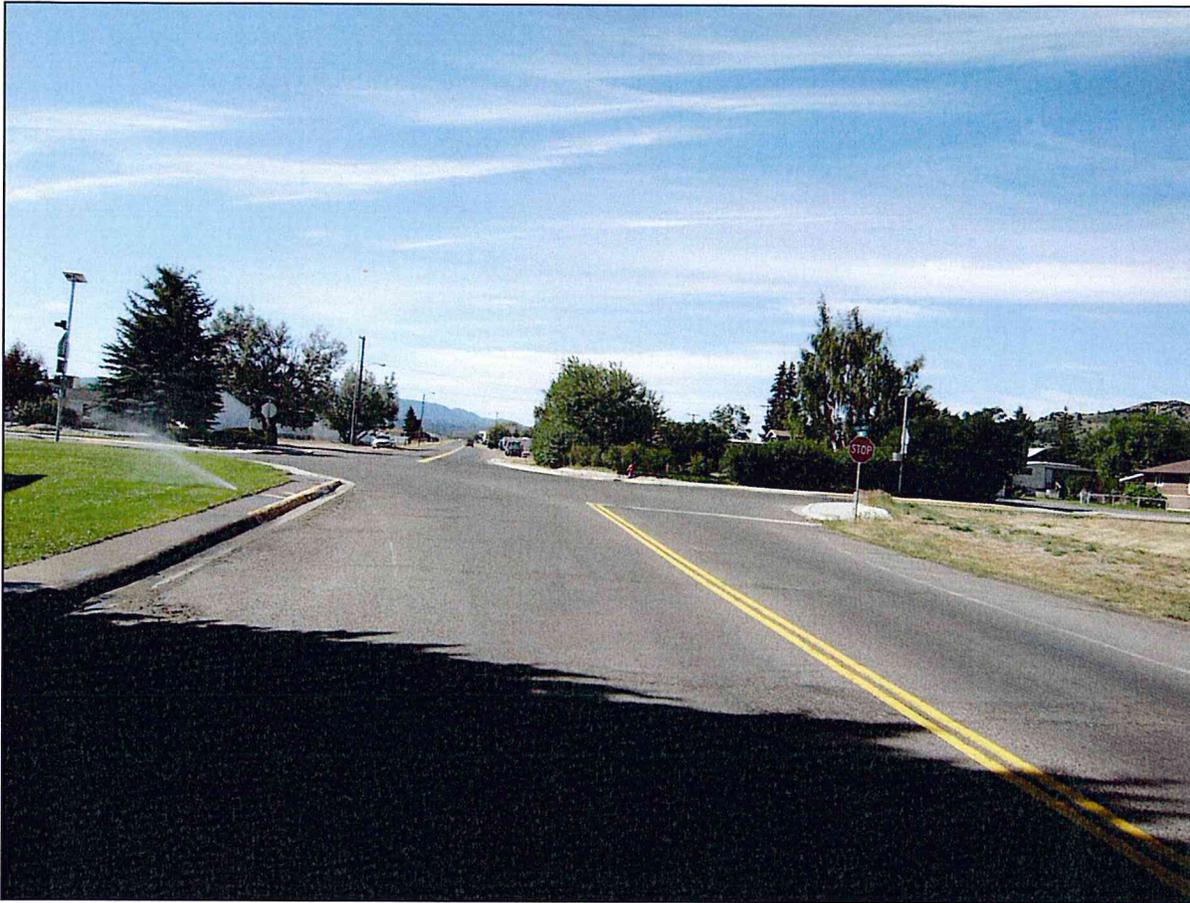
Overview of project area. Looking south along Hill Avenue through intersection to Warren Avenue.
